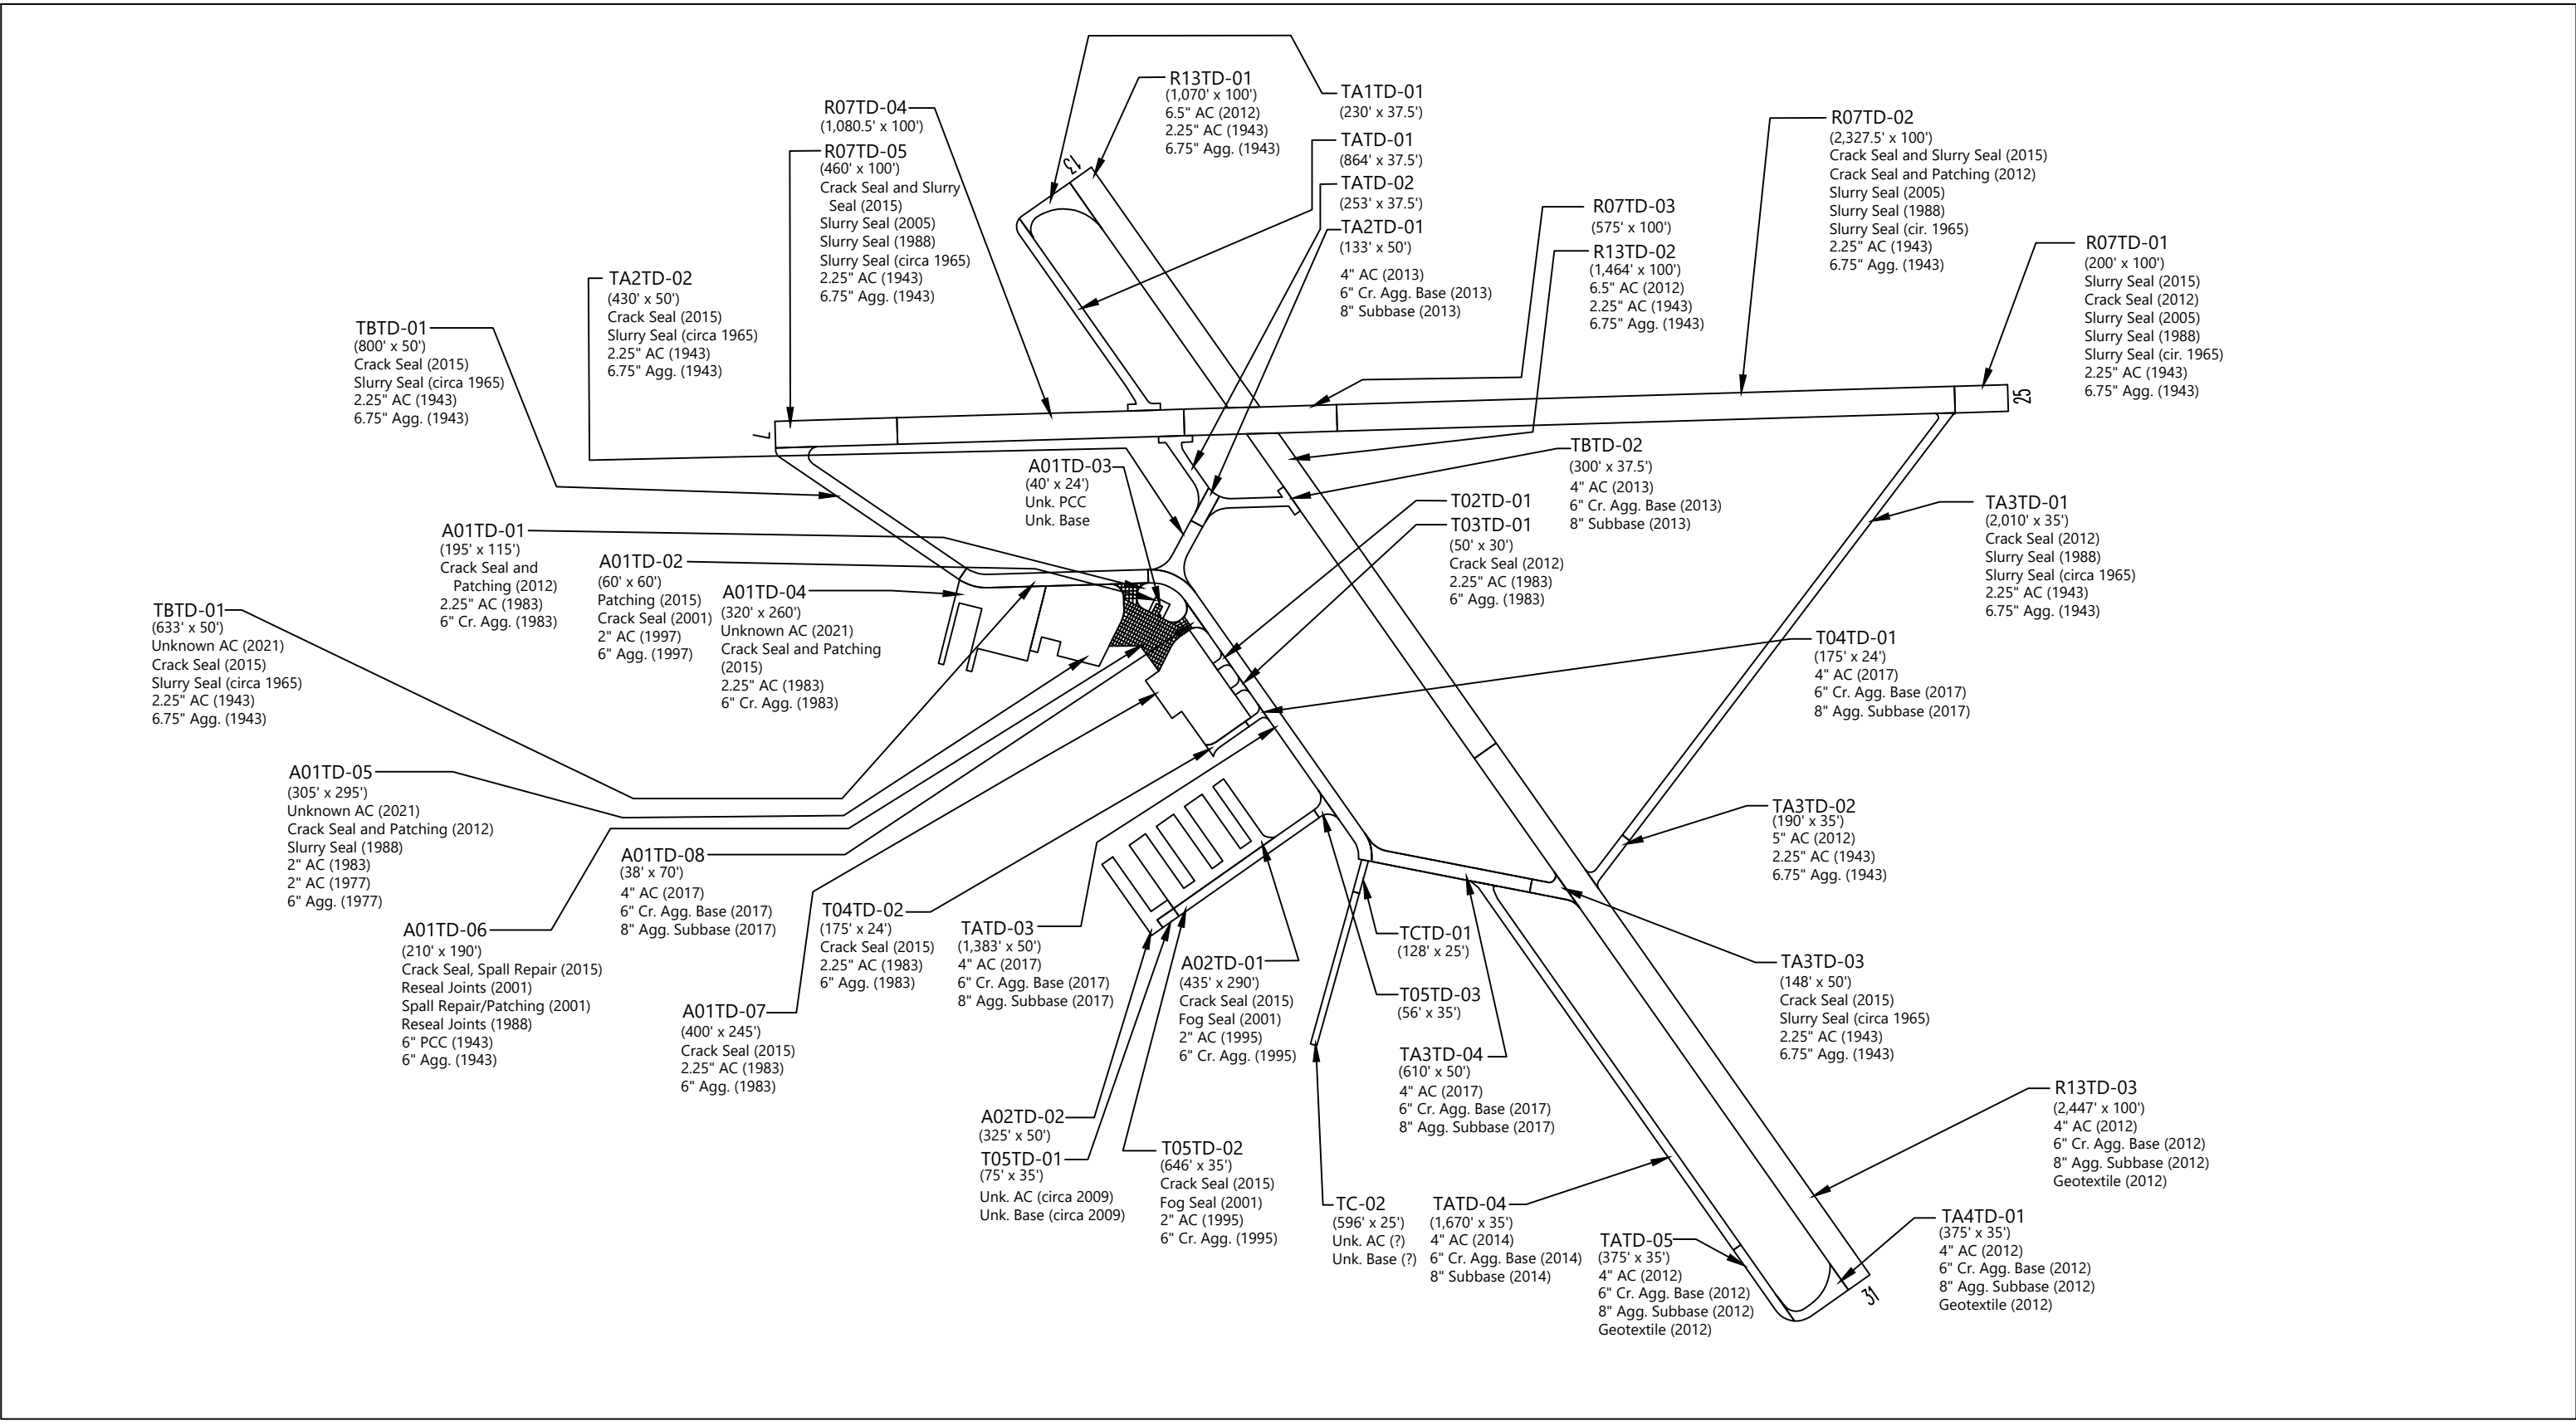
THE DALLES MUNICIPAL AIRPORT PAVEMENT AREA BY BRANCH USE
